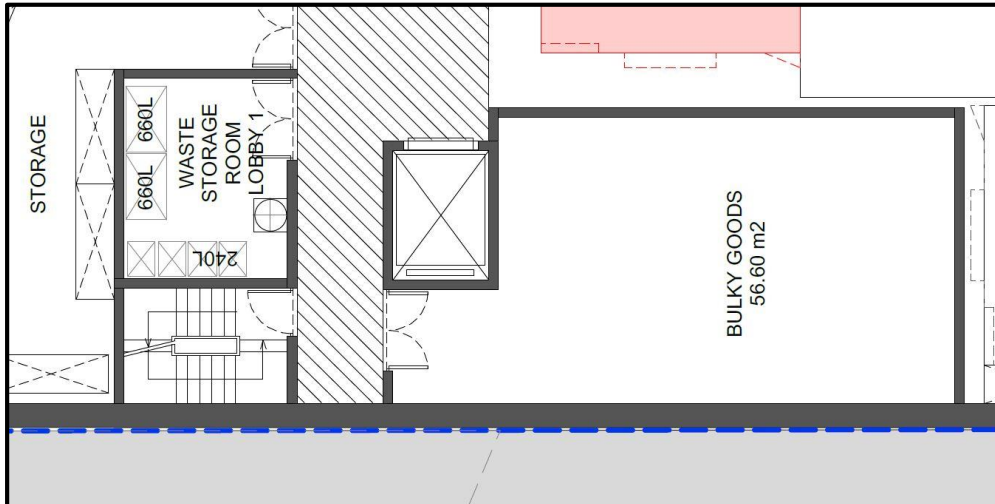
Approved Basement Level 1 – portion showing Lift Core A, waste storage room and bulky goods storage
